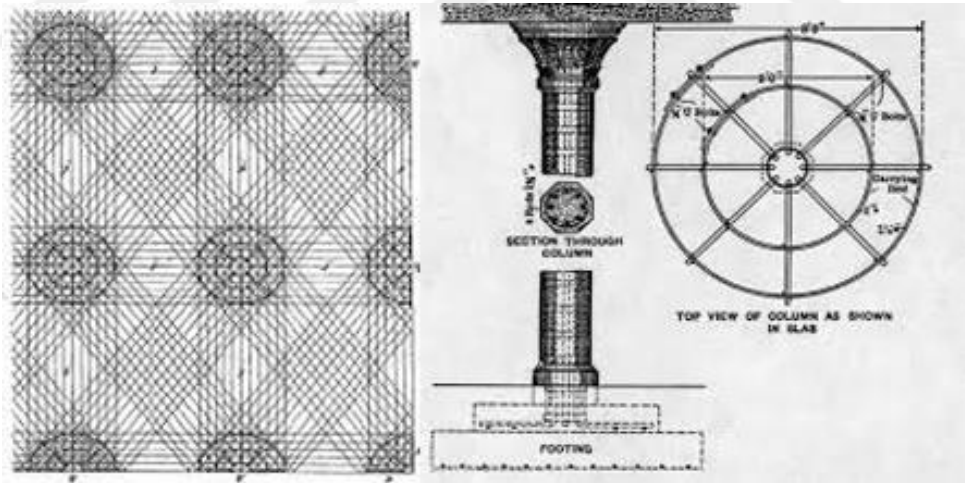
The first mushroom floor (Coronelli, D. et al. (2016)).
